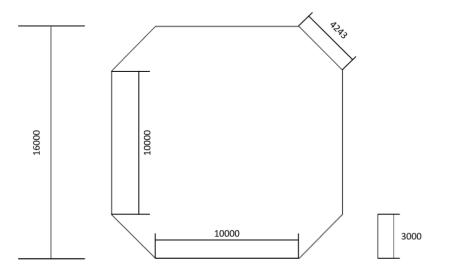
Horizontal dimension of tanks in millimeter
